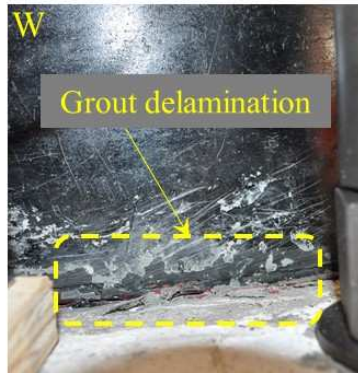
Minor grout delamination at PU-foundation interface in PUED-1 rocking column at 1.8×DE.
